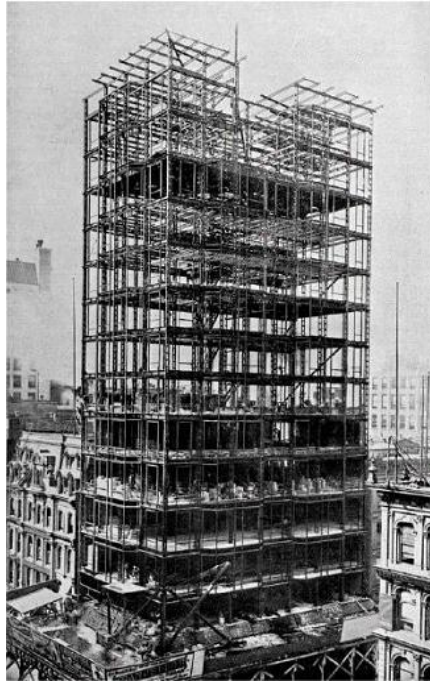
Construction of the Structural Frame of the Reliance Building (Source: *Architectural Record*, January-March, 1895, 305, in Murray, *Contemporary Curtain Wall Architecture*, 10.)
